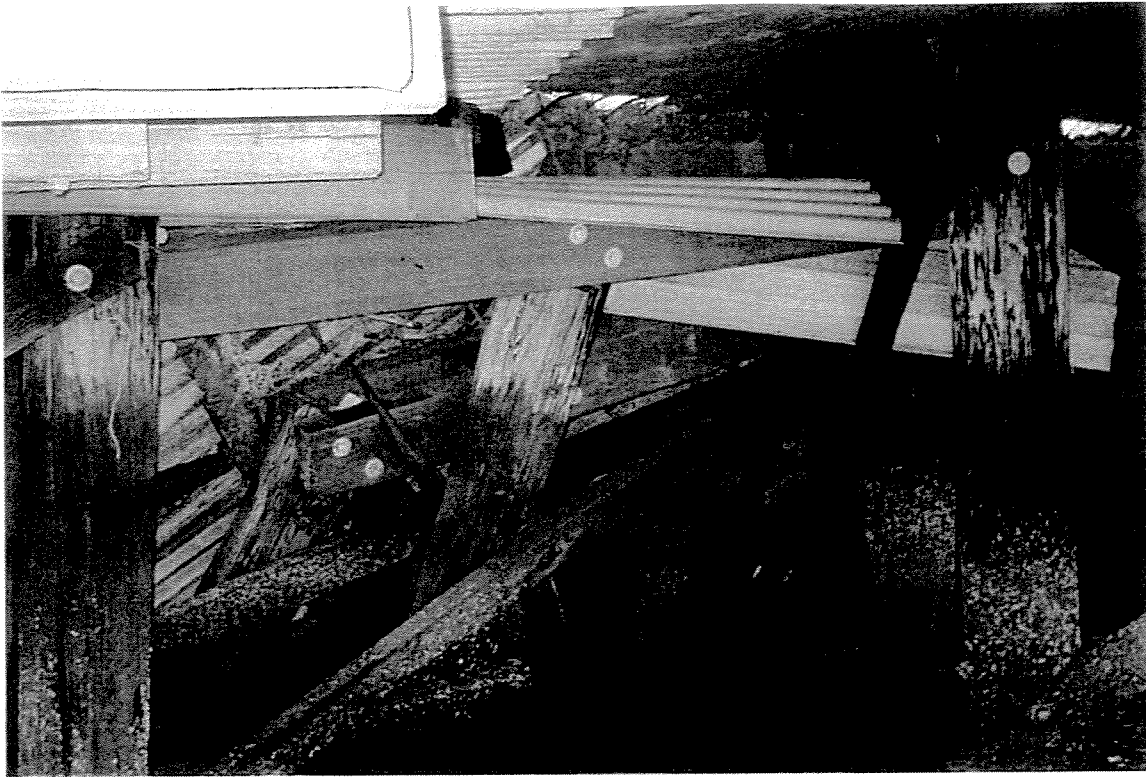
Between pile bents 79 and 78 at the north side of pier. General view of collapsed area with severely displaced piles, looking south.
